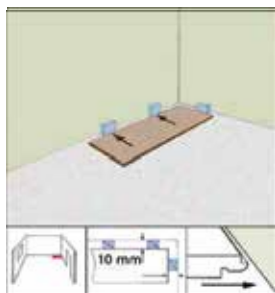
Starting from right to left place the first board in position, using spacers 10mm from wall.
